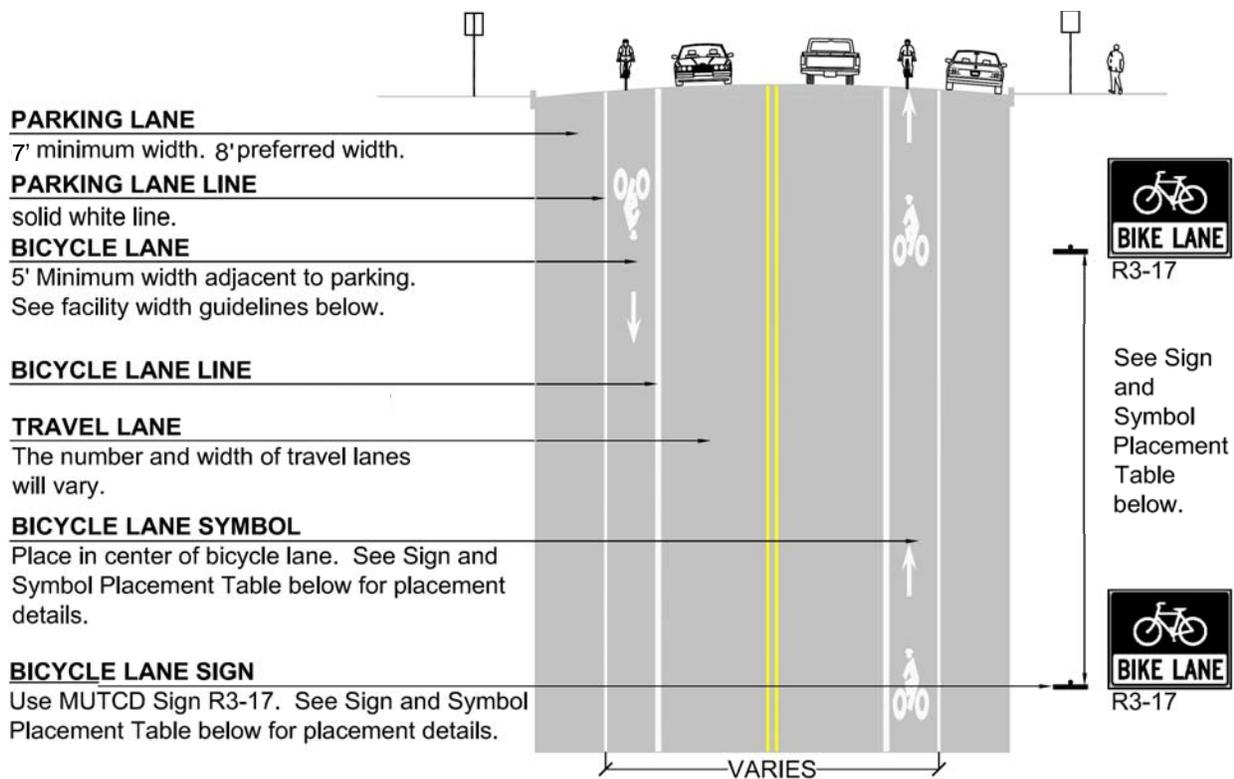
Bike Lane Striping Next to On-Street Parking
